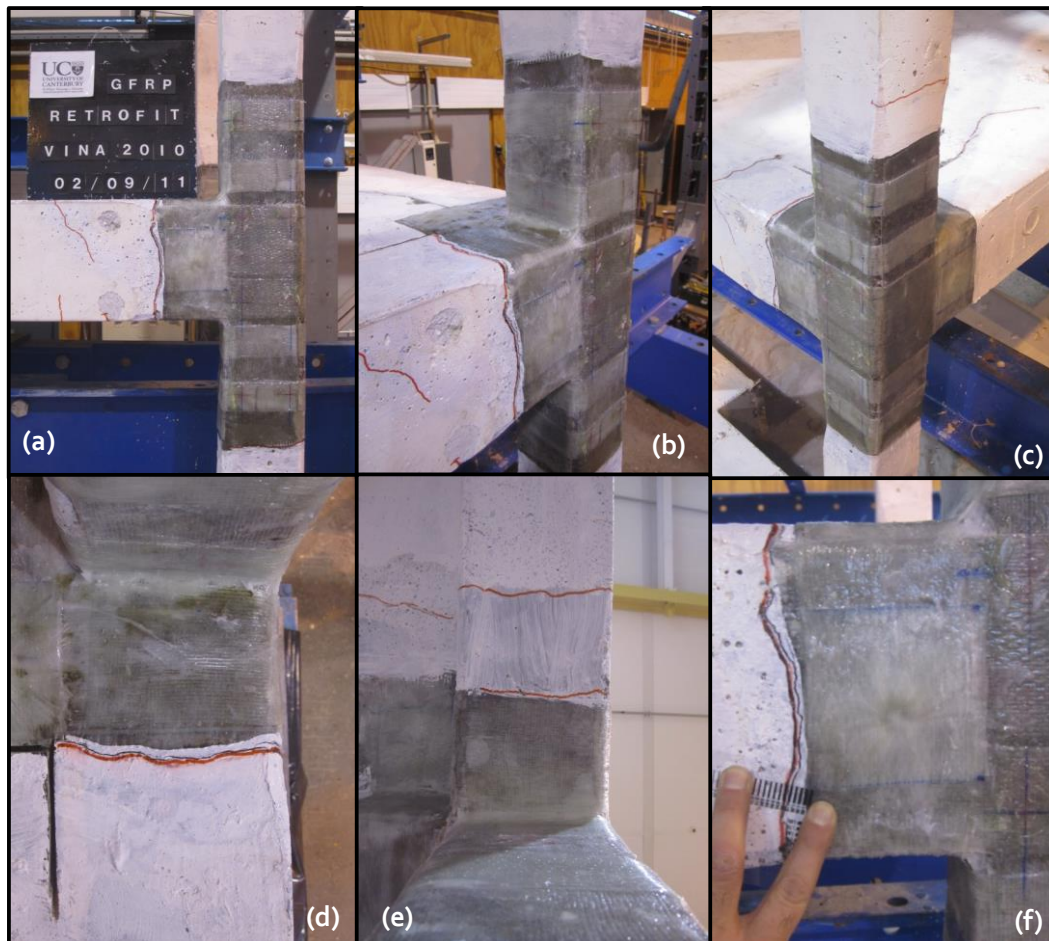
Observed damage in the 1st floor short span corner beam column joint; (a) front view, (b) 3D view from the front, (c) 3D view from the top back, (d) top view over the beam, (e) view from below, and (f) view from the side – beam crack close-up.
